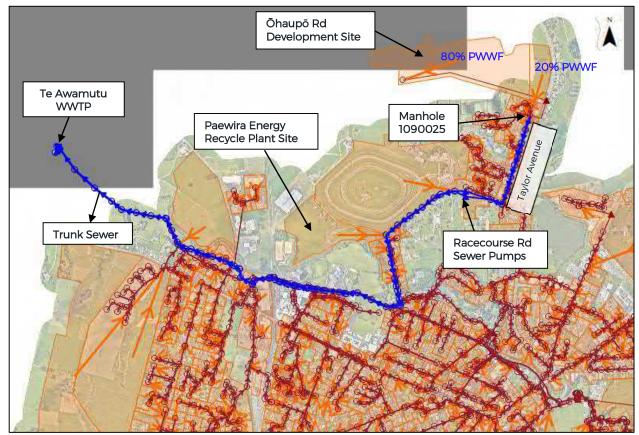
Catchment Location Plan (downstream pipes shown in blue)
